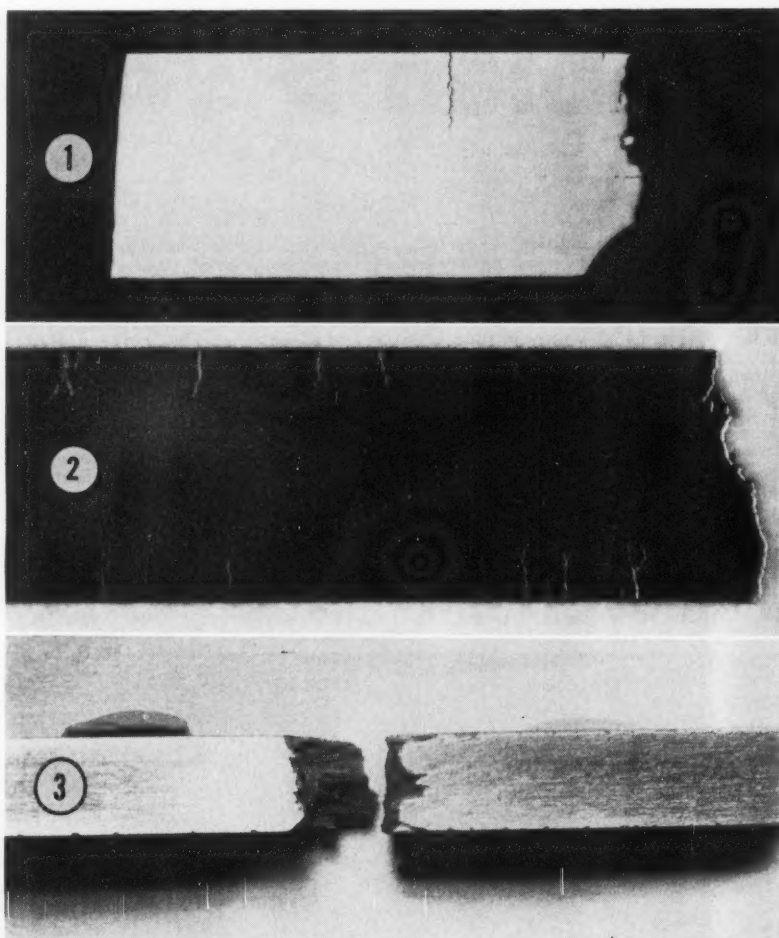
Stress corrosion failure of steel wire used in prestressed structure. (Longitudinal section).
